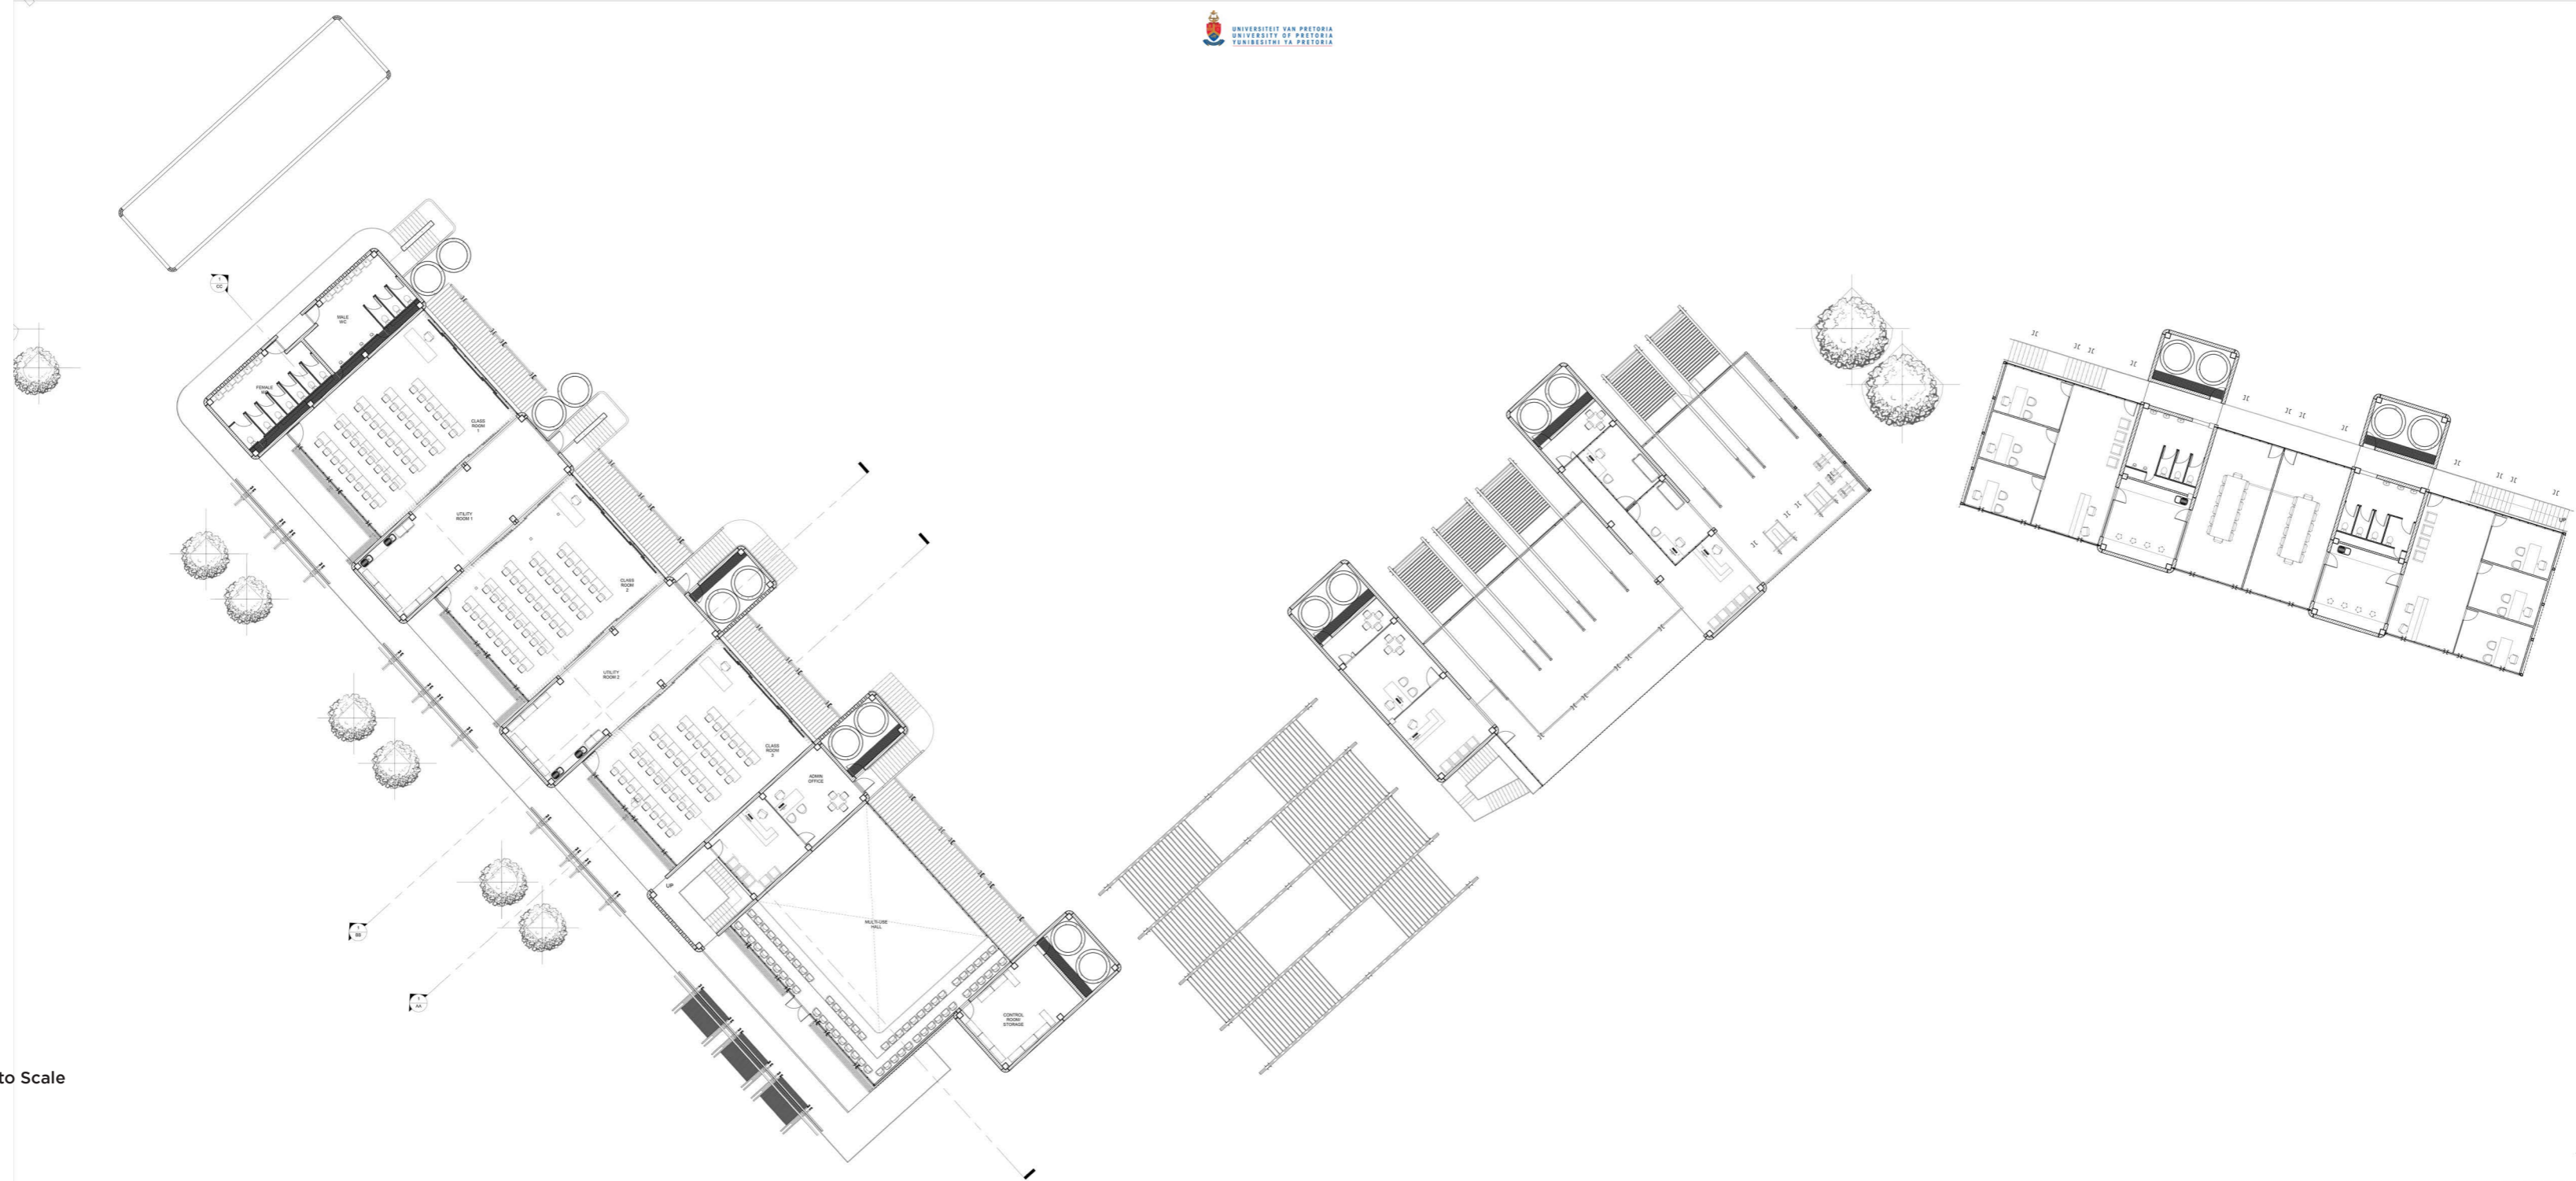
Quarter 3 Crit First Floor Plan - Not to Scale
